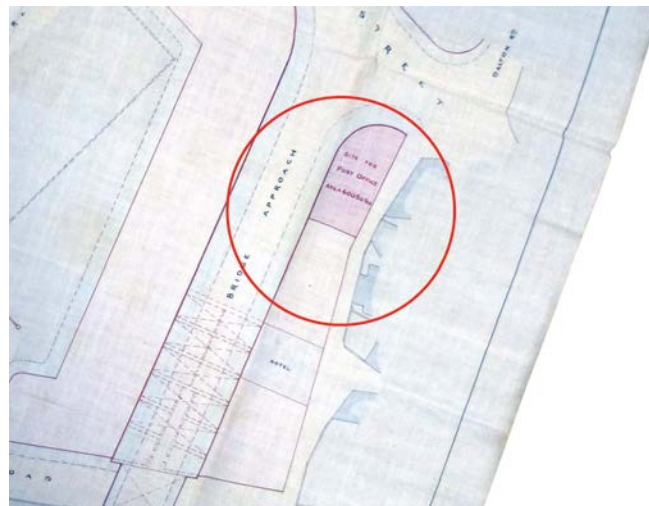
Extract from the proposed site location plan for the General Post Office of 1884
